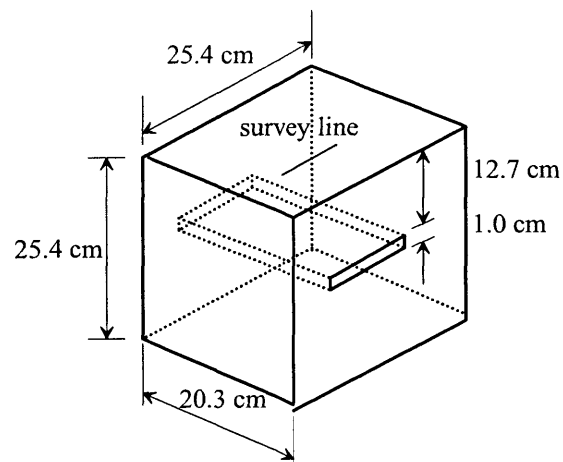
The dimension of the mortar specimen. The polyethylene plate is ended in the middle of the specimen.
